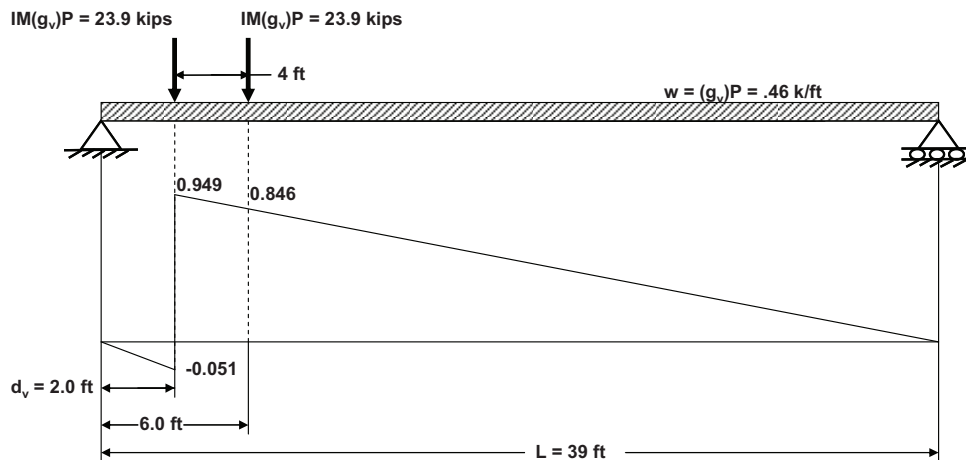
Exterior Beam Shear Design Tandem at  $d_v$
